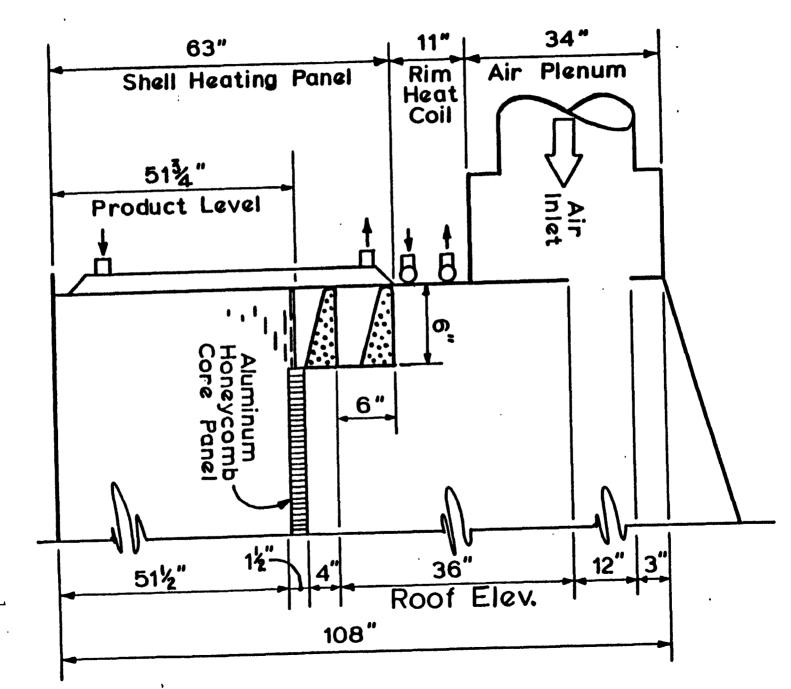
Elevation view of contact bolted IFR in test tank. $^{
